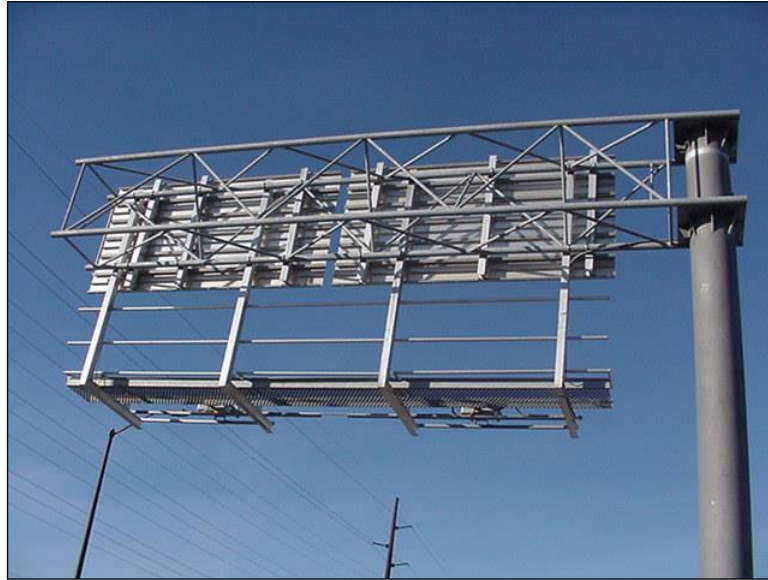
Typical Four-Chord Cantilever Sign Bridge.
